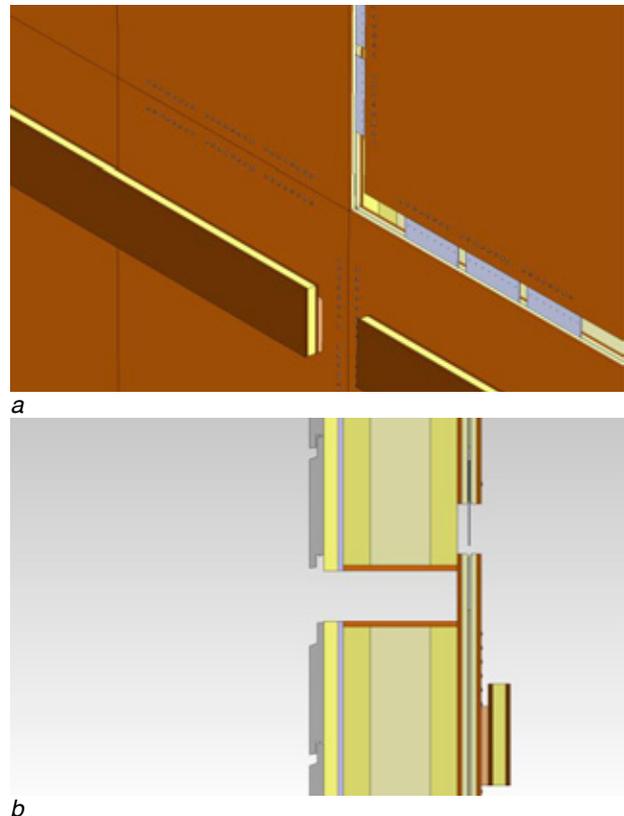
External wall-to-wall connection interface with slotted-in steel plates and screw connectors. (a) The steel plates brace the wall and transfer horizontal wind load and vertical up-lift forces down to the foundation; (b) Solid timber head and sole plates in conventional wall construction are replaced by hard fibreboard strips to minimize settlement.
